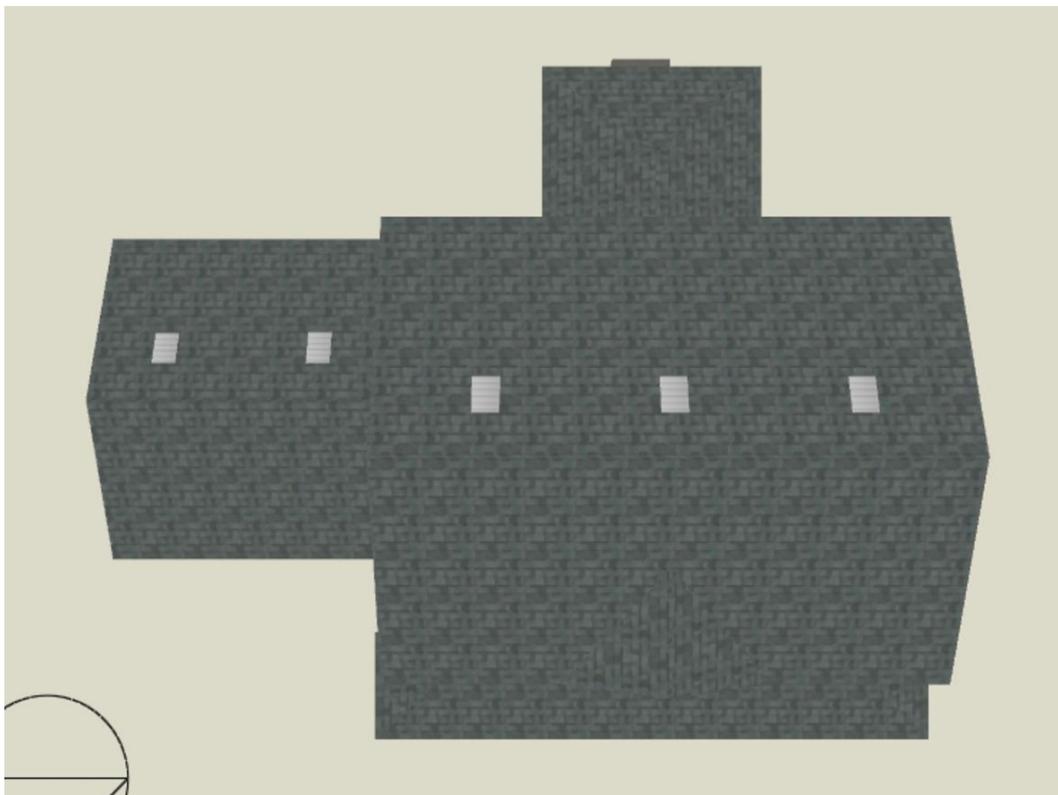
Rendering - Roof plan of MH.
